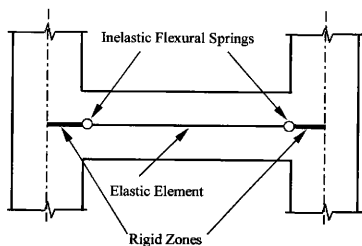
Idealized Reinforced Concrete Beam Element [Adapted from Raffaele and Wight (1992)]
